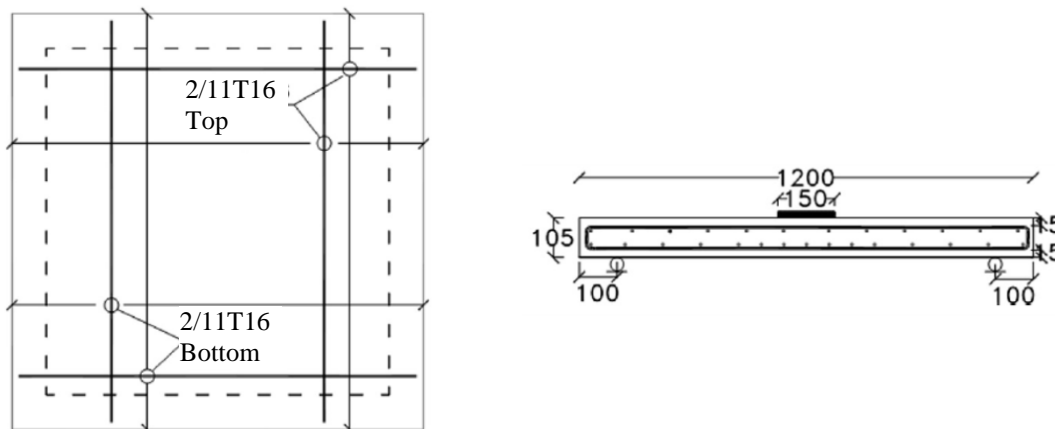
Specimen Detail (Aghayari et al., 2015)
